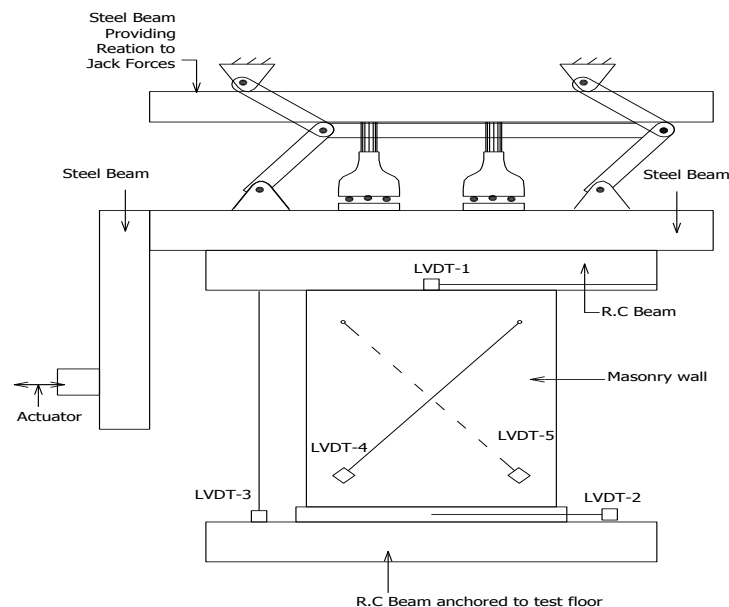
Testing Setup used for Conducting in-plane Quasi-Static Cyclic Tests on URBM Walls.
